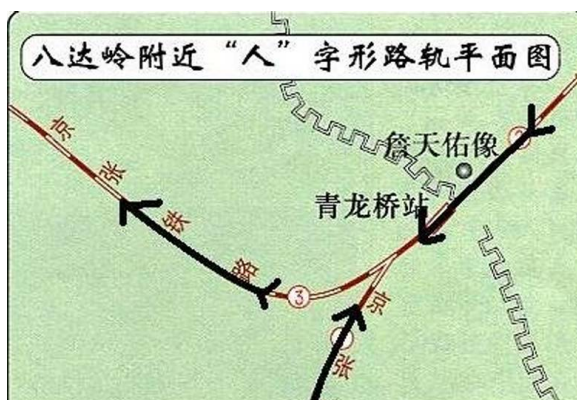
Plan view of the “herringbone” section of the Beijing-Zhangjiakou Railway
